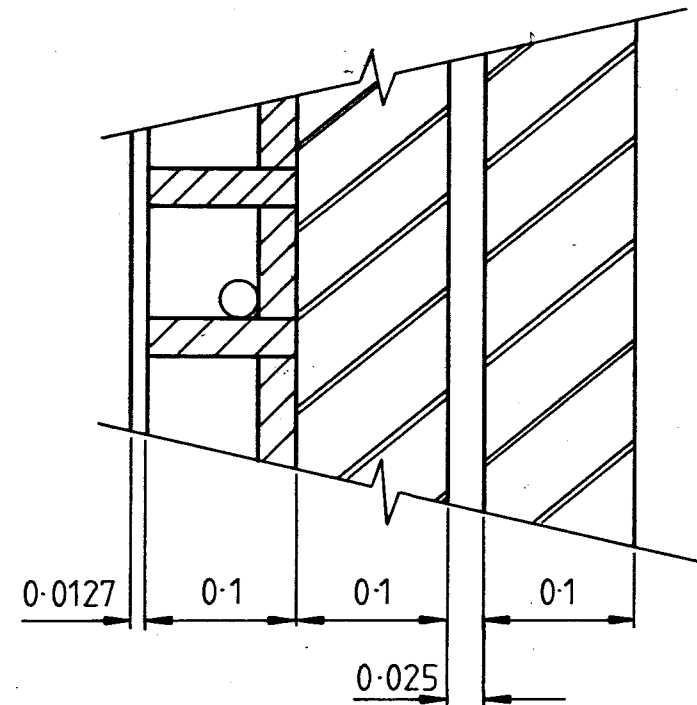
BUILDING FABRIC OF A DOMESTIC HOUSE
